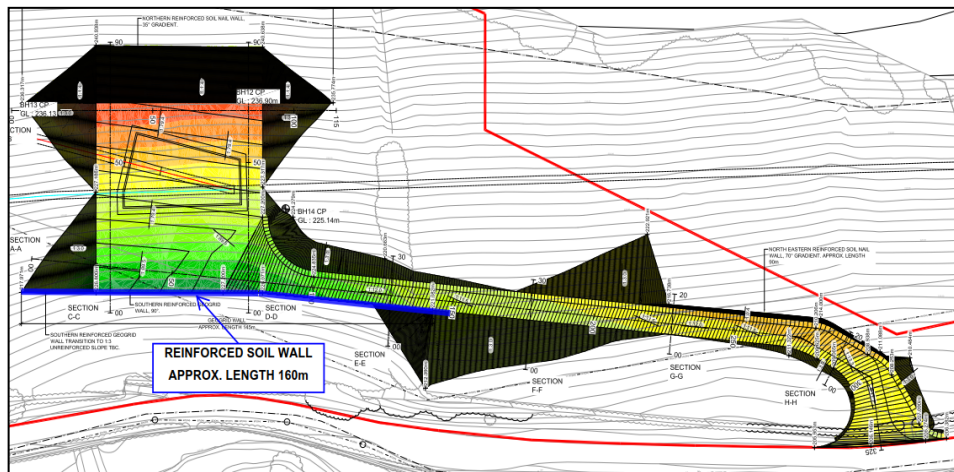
Plan View: Downstream EVA Bleddfa – RSW
